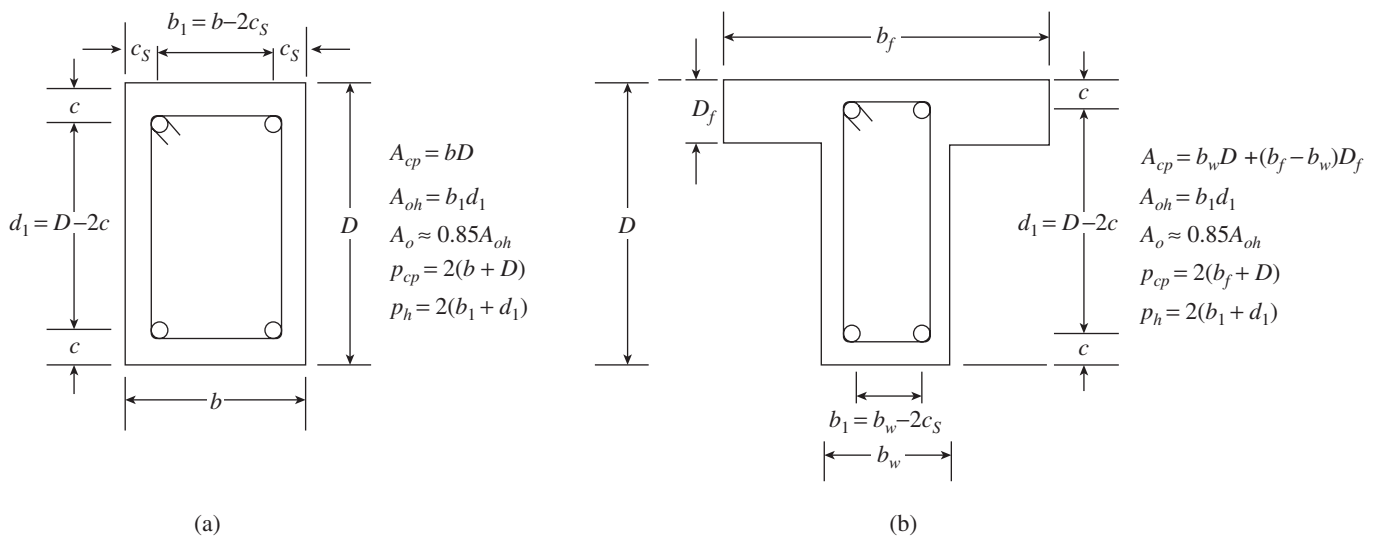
Stirrups for torsion (a) Closed stirrup in rectangular beam (b) Closed stirrup in T-beam section
